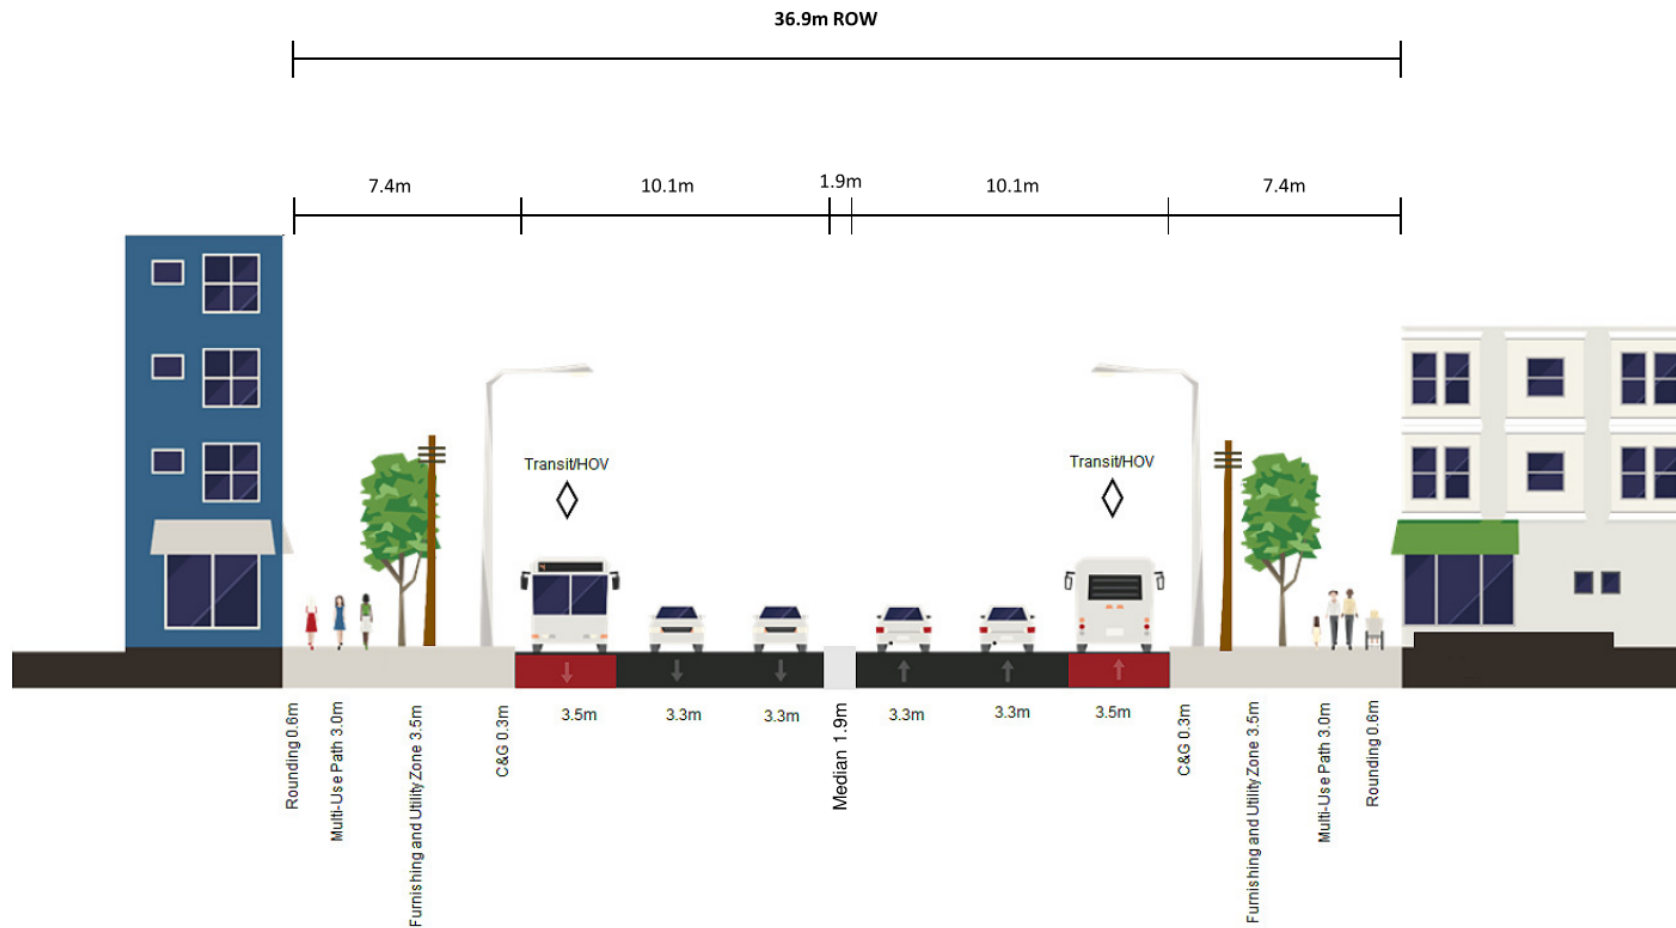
RECOMMENDED Midblock Typical Section – Six Lanes for Transit / HOV with AT facilities for Future Conversion
